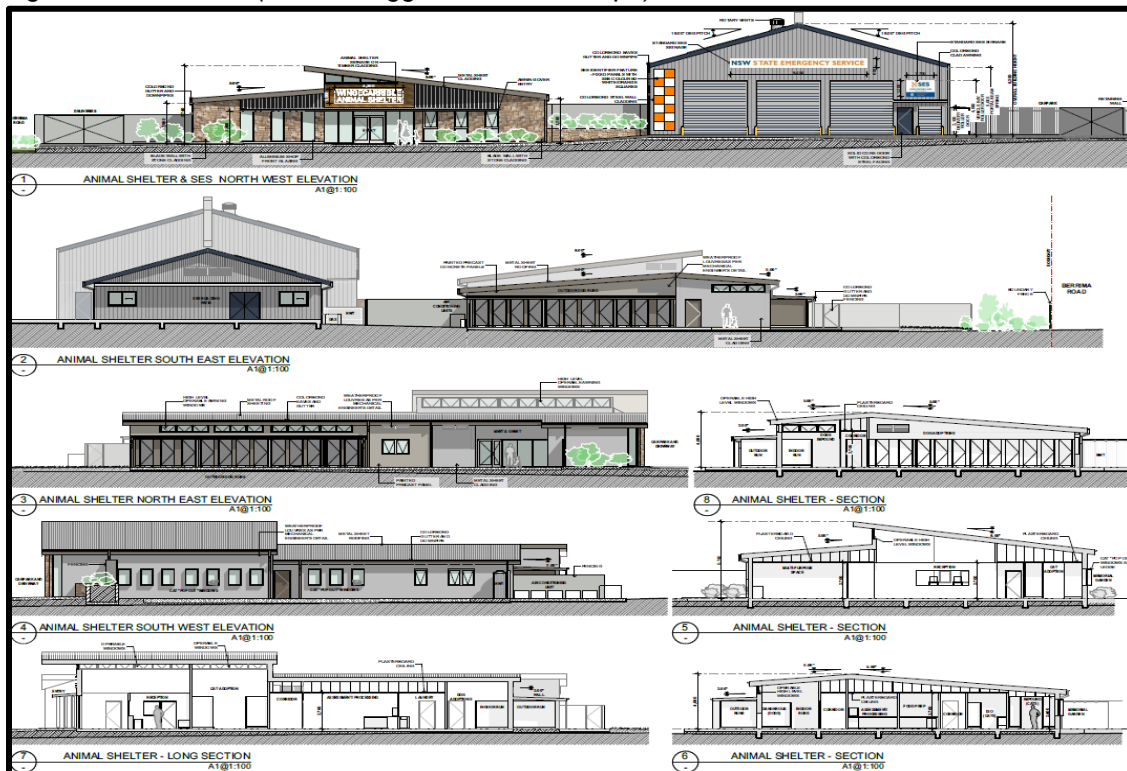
Elevations and Sections (Source: Figgis + Jefferson Tepa)
